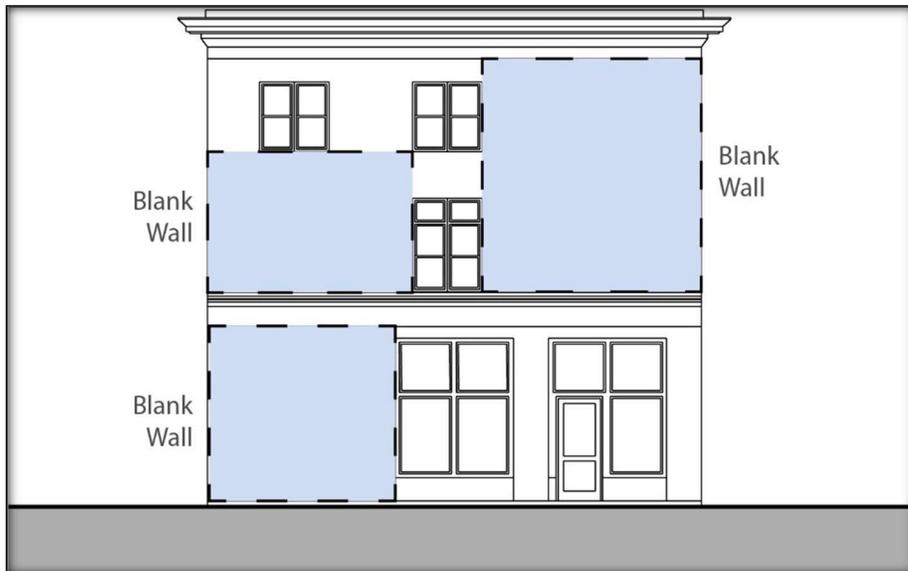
VERTICAL & HORIZONTAL STREET FACING FAÇADE MODULATION
